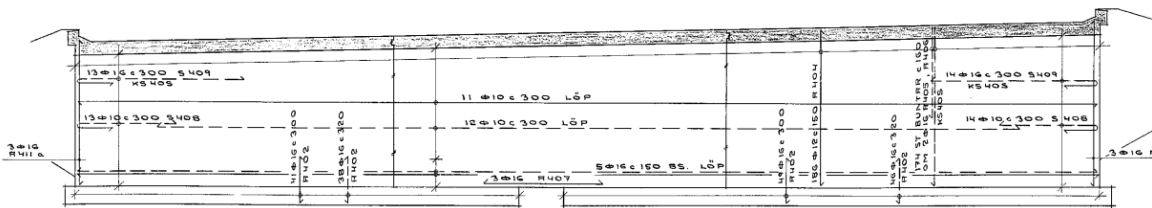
Reinforcement drawing for the front wall of bridge 12-604-1.
